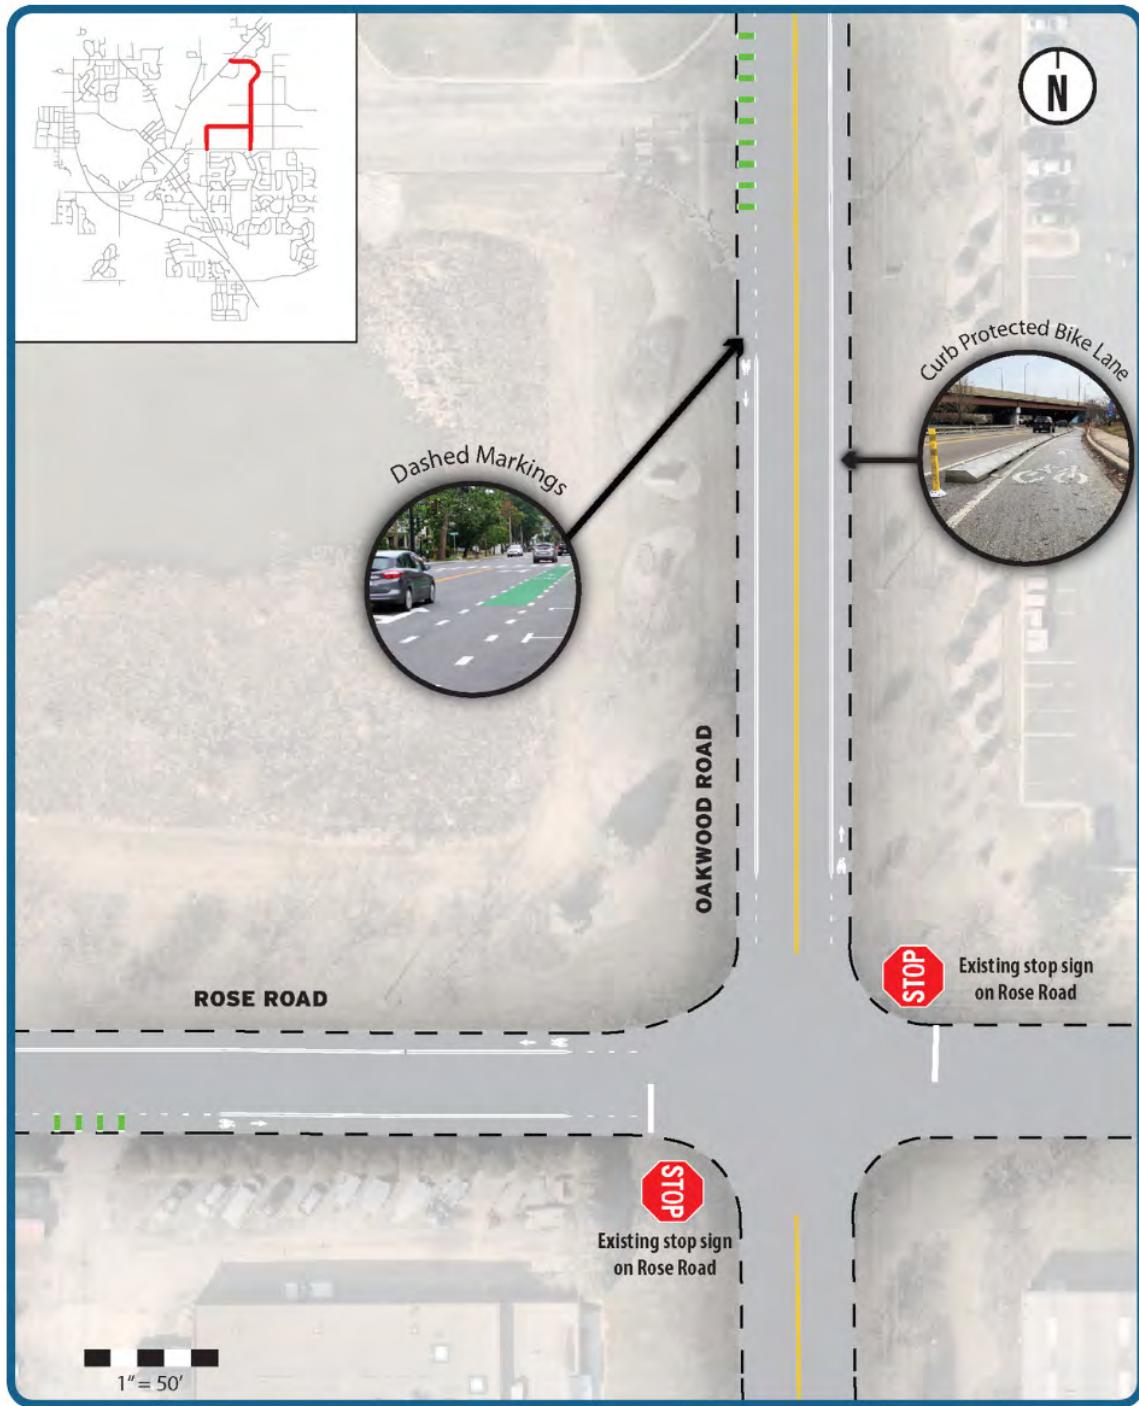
highlights recommendation to install on-street bicycle facilities on Oakwood Road, Rose Road, and Telser Road. New north-south connections can link residential areas south of Route 22 with critical destinations in northeast Lake Zurich, and supports north-south connectivity and walking/biking between the northeast industrial area and businesses along Route 22.
